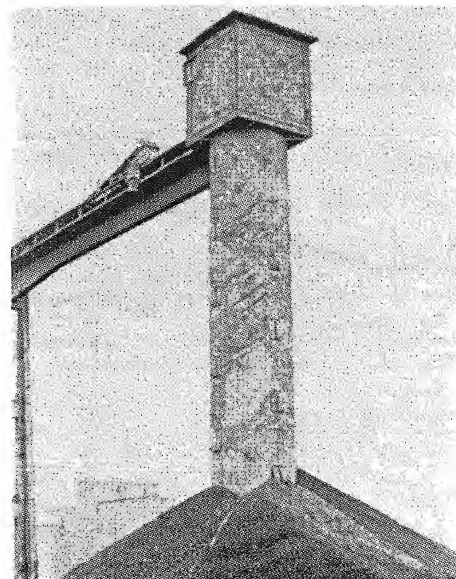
Concrete tower on outdoor clinker stockpile (from Funke, 1968)
